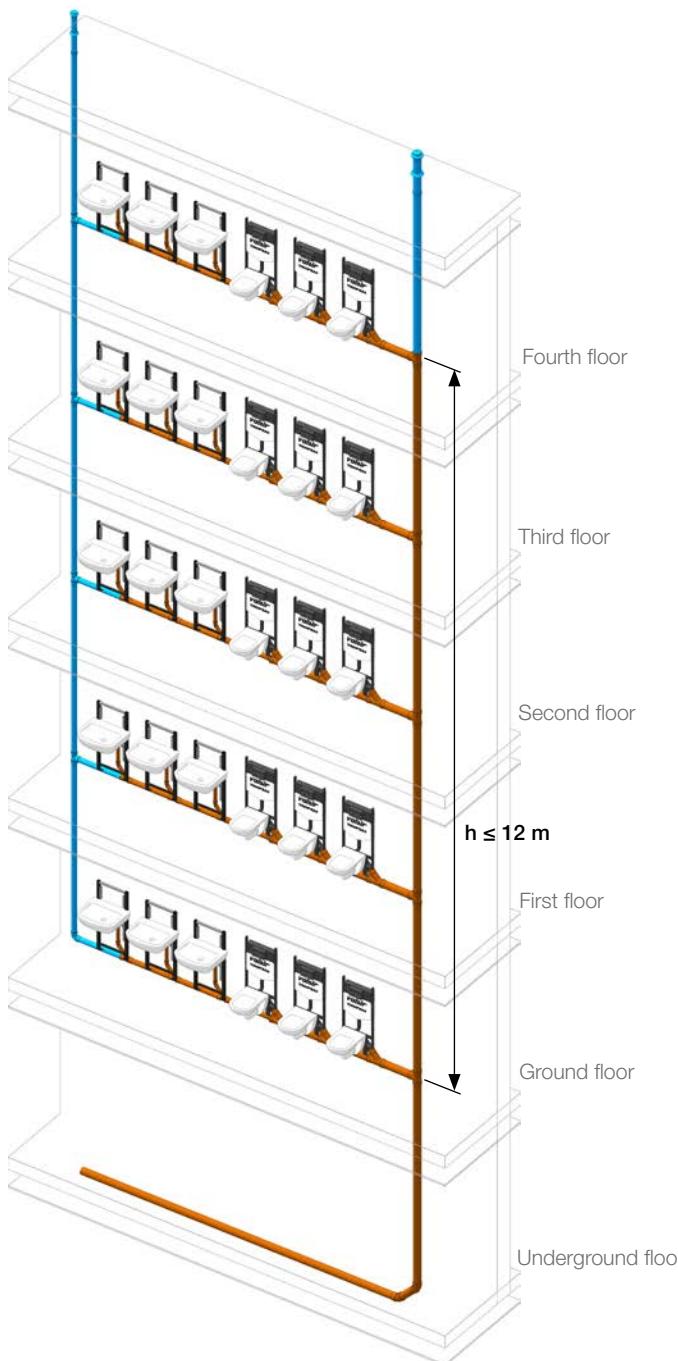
Indirect parallel vent, 3÷5 storey building ($h \leq 12$ m), collector in the ceiling of the underground floor.
